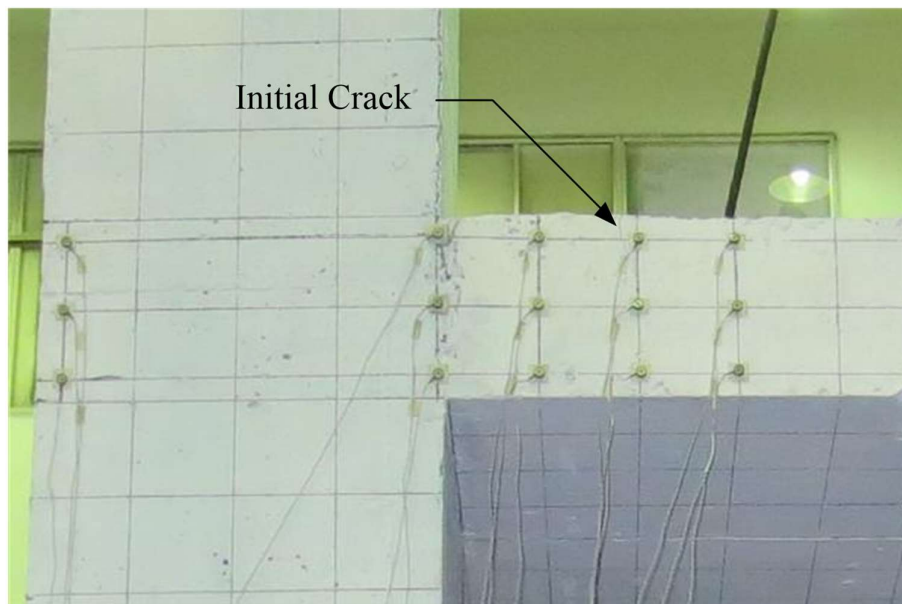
Initial Crack on the West Face of the Slab of Specimen R3
